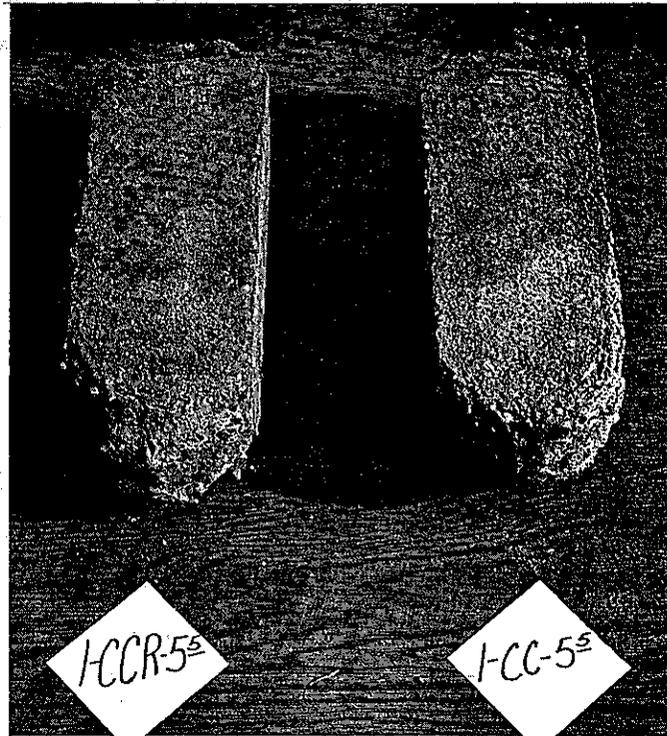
5-1/2-sack shrinkage compensated cement concrete beams after 26 months sulfate exposure. Beam on left is internally reinforced.
